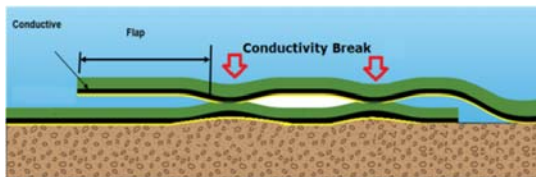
Welded seam via Iso-wedge welder.
